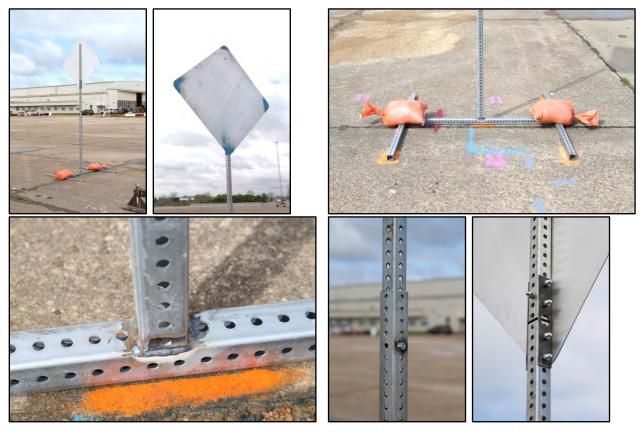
Option B Temporary Work Zone Sign Support Used for Test No. 490026-2-4.
